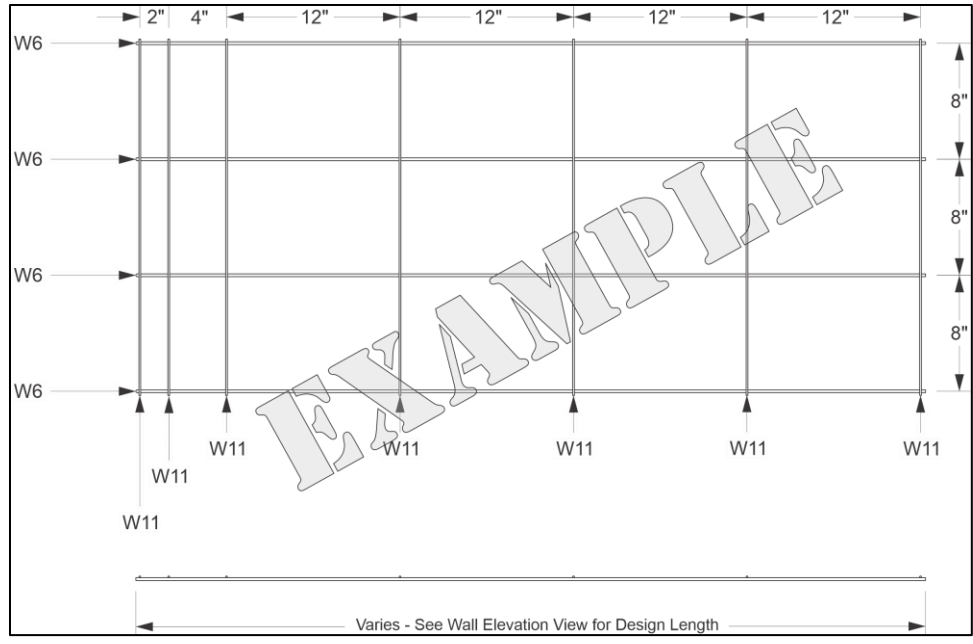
Example shop drawing for welded wire type MSE wall reinforcement
